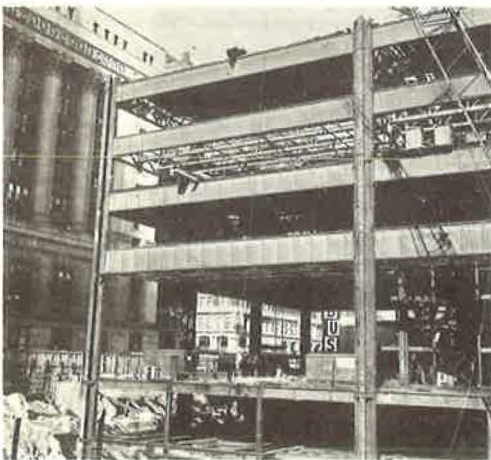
View of early stage of construction of Chicago Civil Courts Building.
